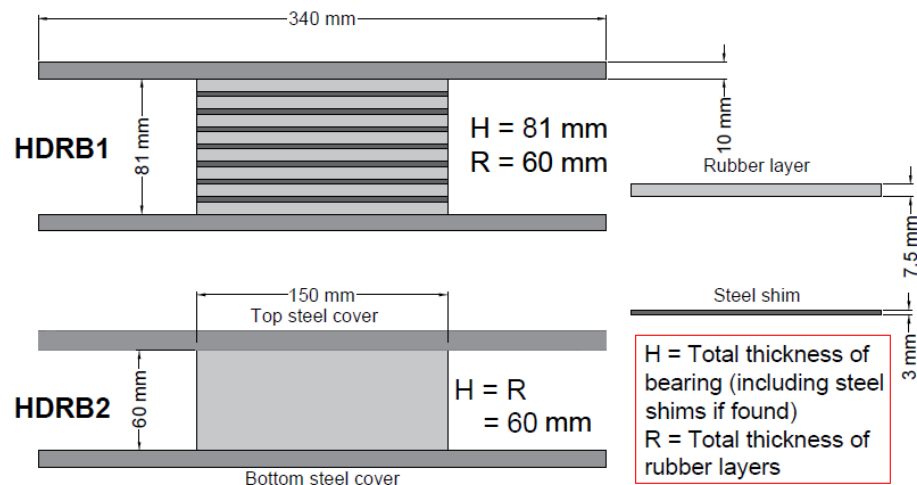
Configuration of typical and developed HDR bearings for compression testing
